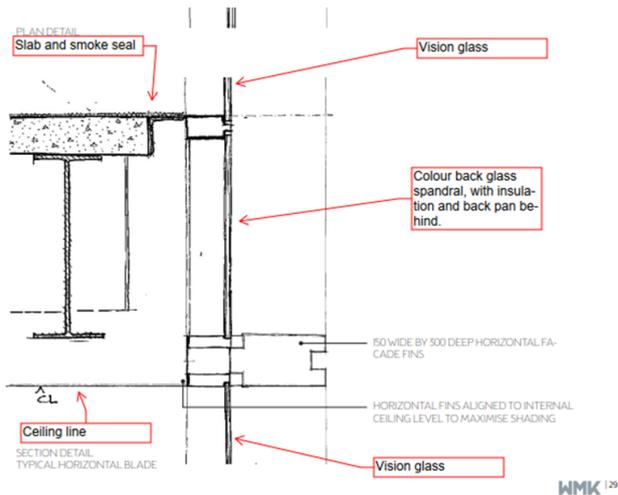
Details in the Design Report. An opaque spandrel is required to conceal the slab and the ceiling cavity.
